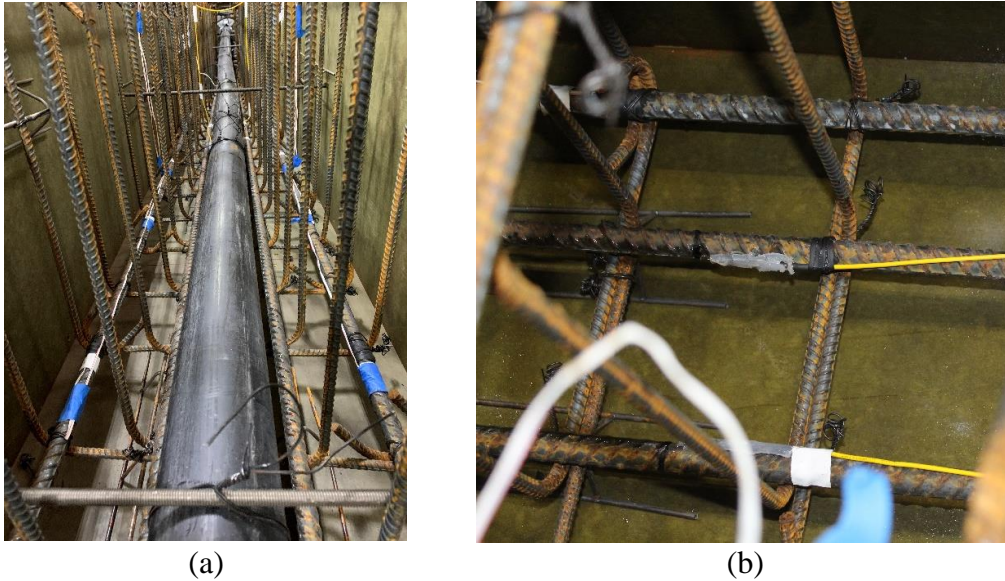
Instrumentation on mild steel bars: CIP beam specimen SS-5
